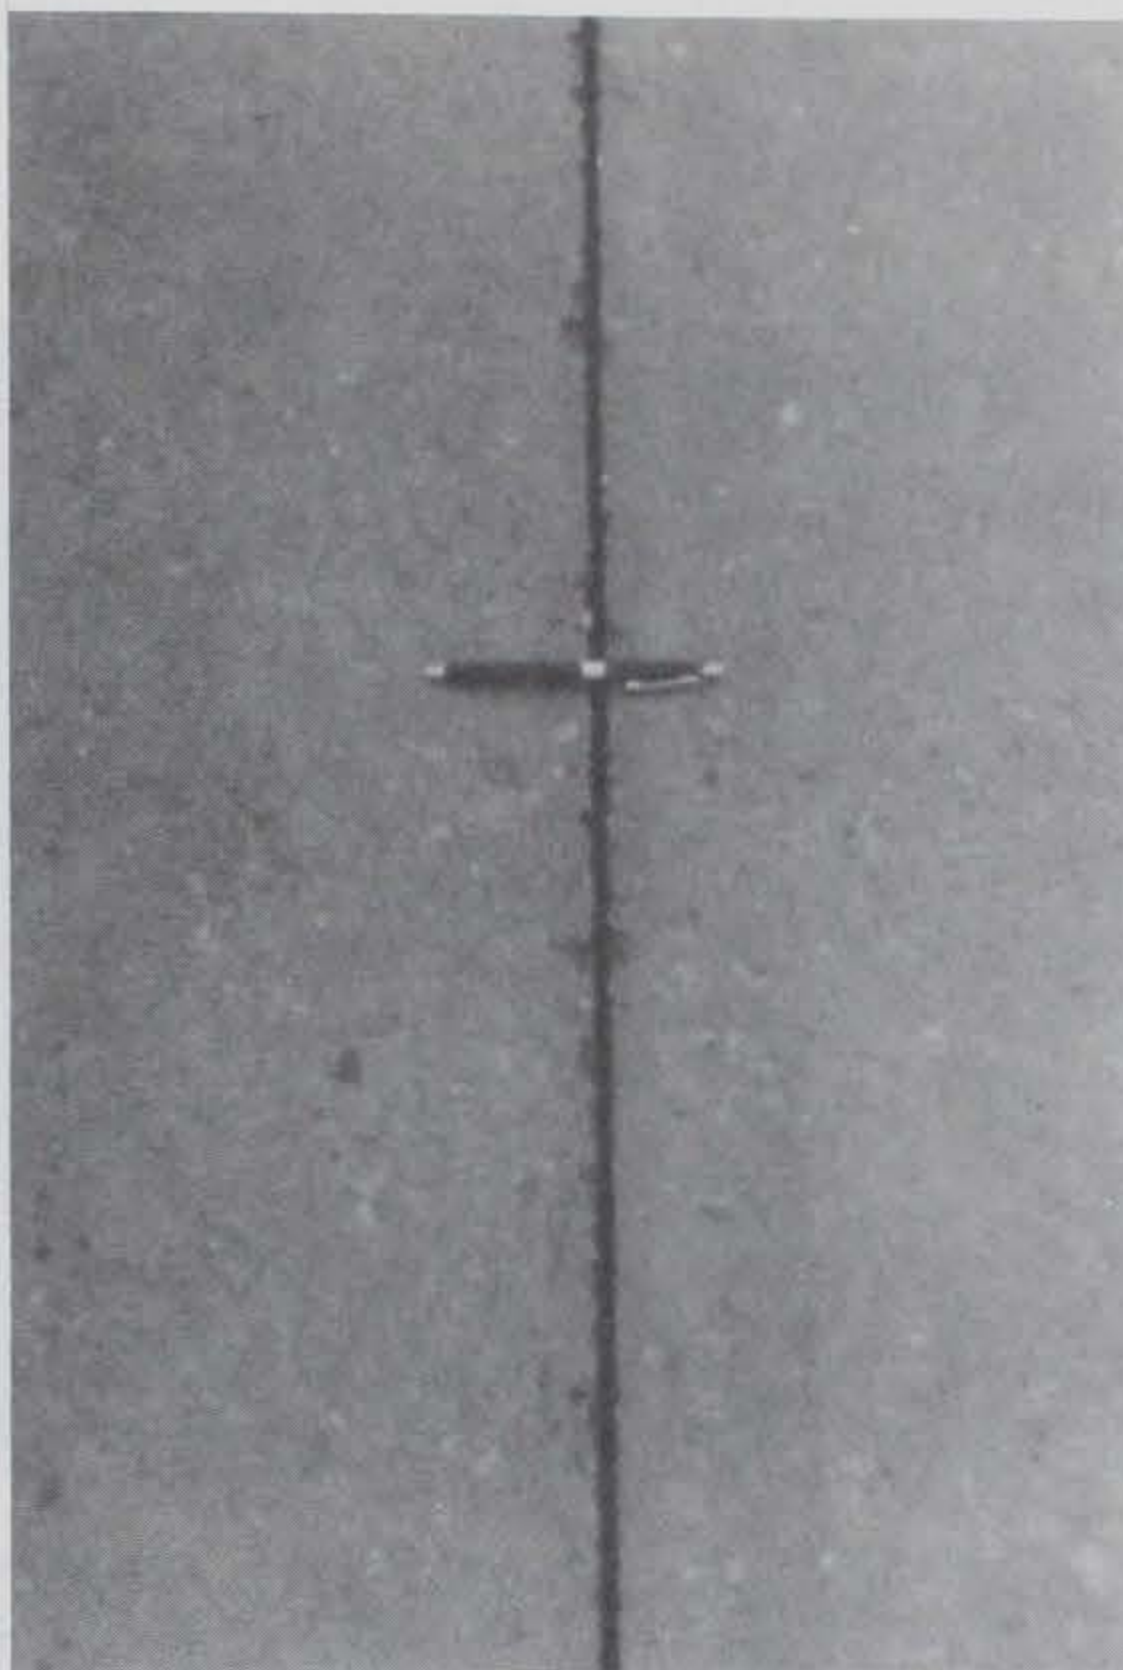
Transverse contraction joints were sawed at 69 foot spacings 12 to 20 hours after placement
